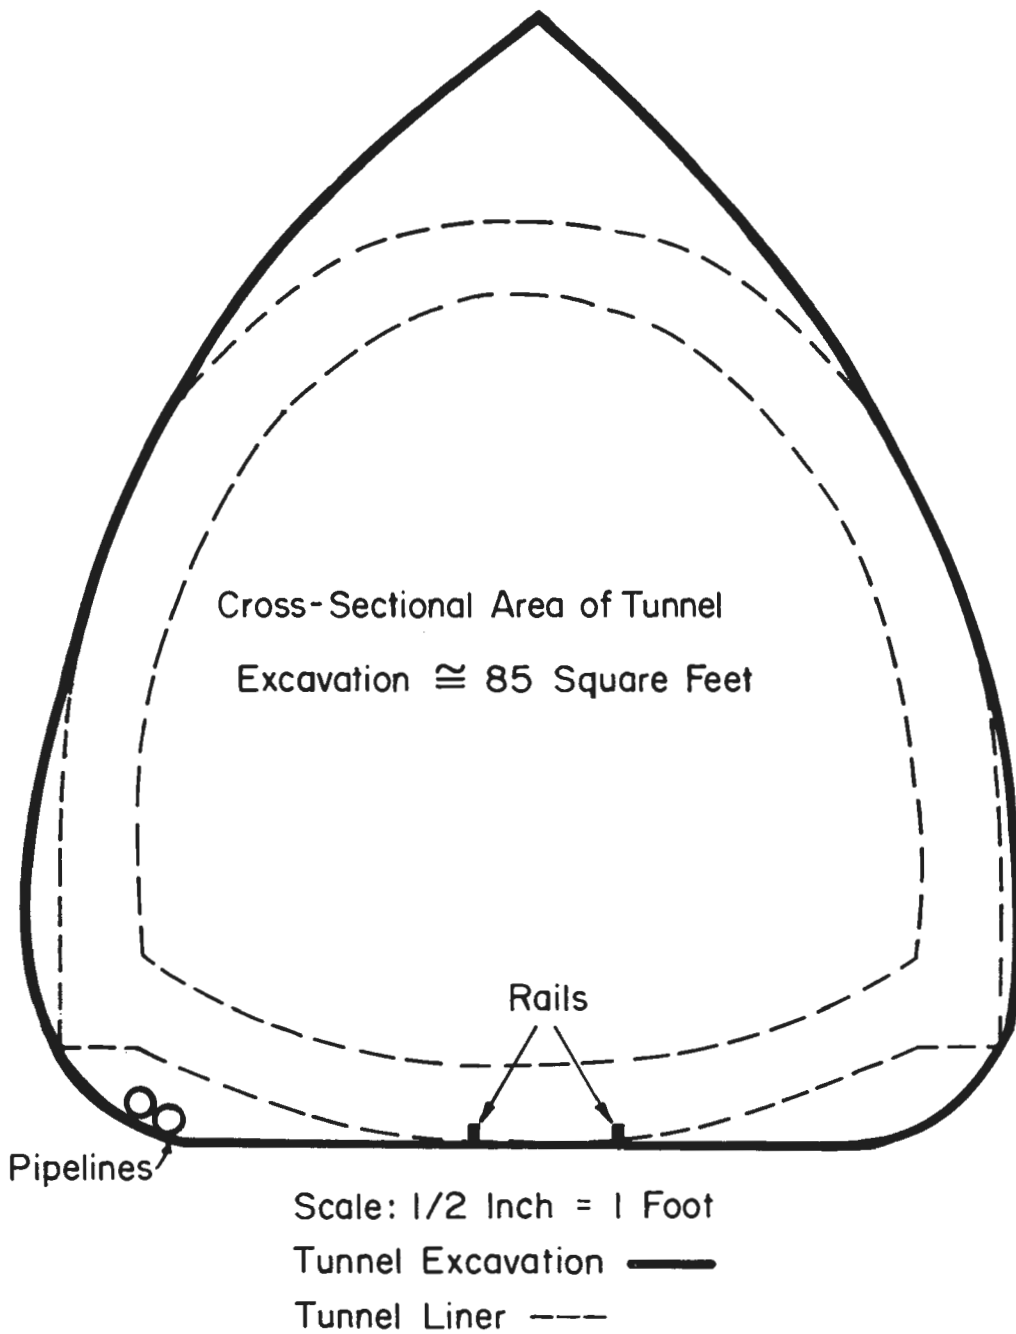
TYPICAL TUNNEL CROSS SECTION
